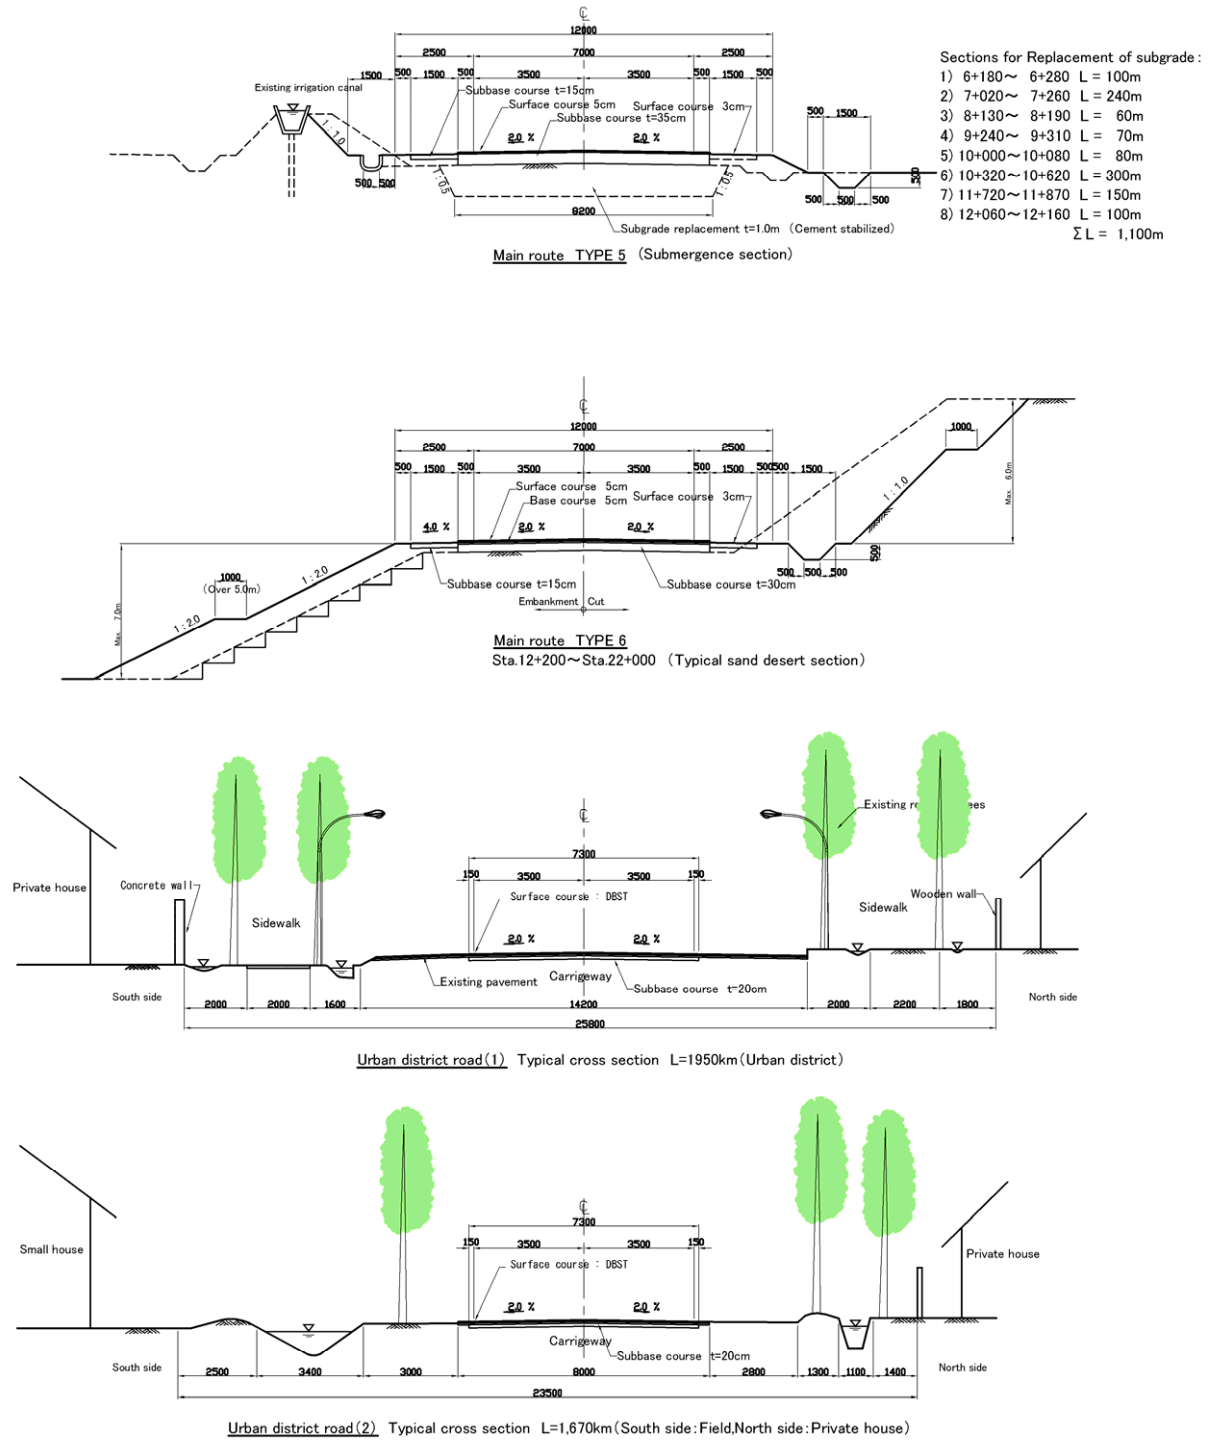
Typical cross sections (Types 5 and 6 for main route, urban district roads (1) & (2))
